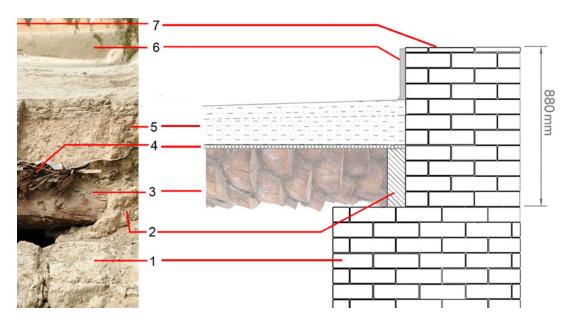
The anatomy of a traditional roof: (1) load-bearing wall, (2) filled area, (3) palm beam, (4) palm frond (+ nylon), (5) sloping mud layer, (6) plaster, (7) parapet wall. Source: Aqeel Ahmed Aqeel, DCT Abu Dhabi.
